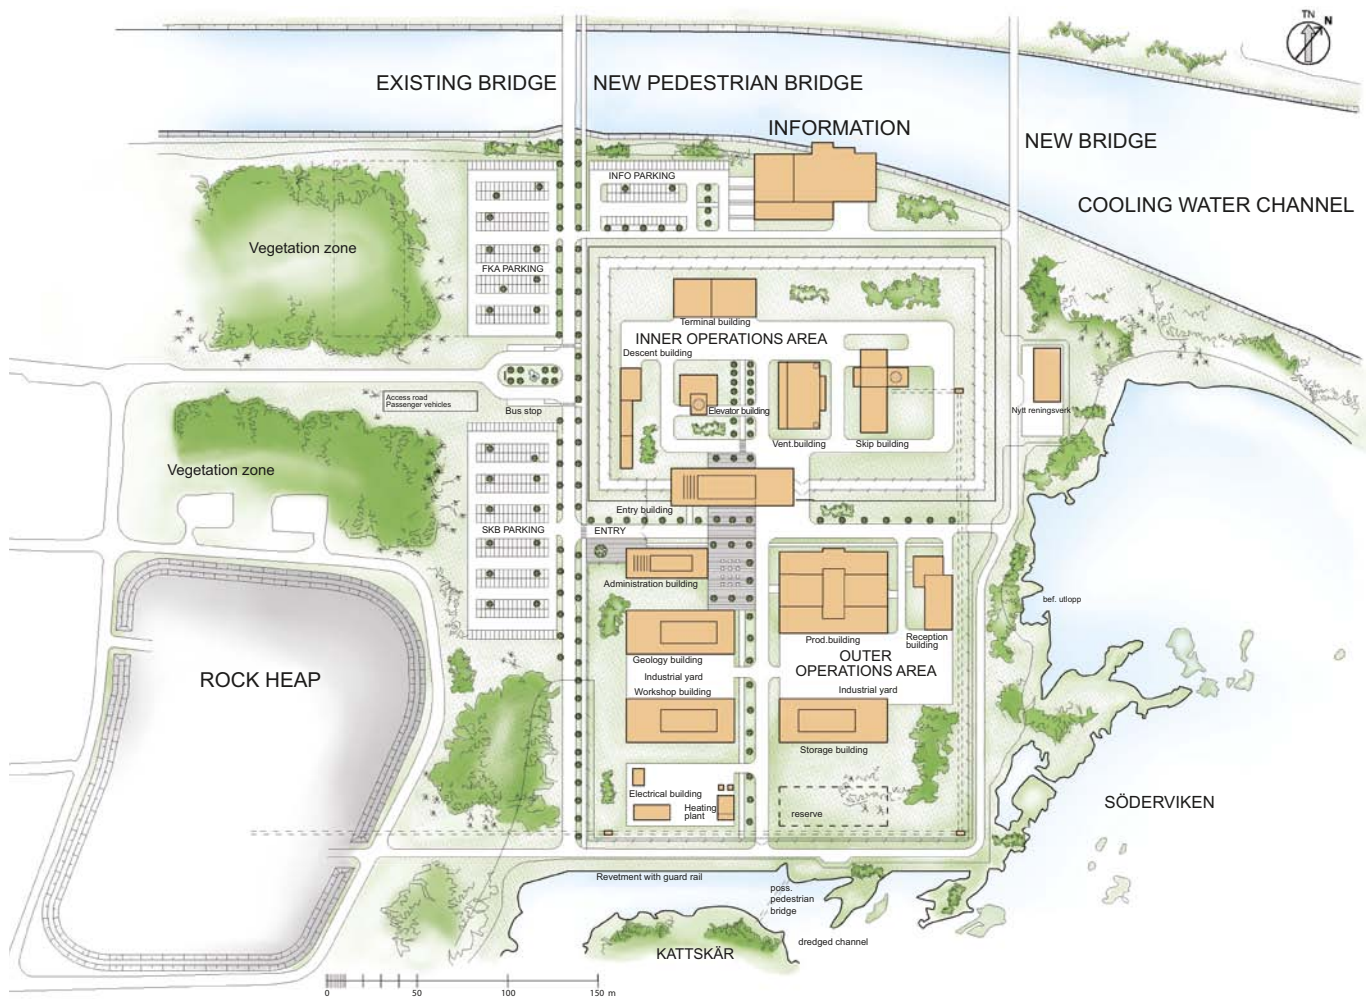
Final repository for spent nuclear fuel in Forsmark – surface part.
